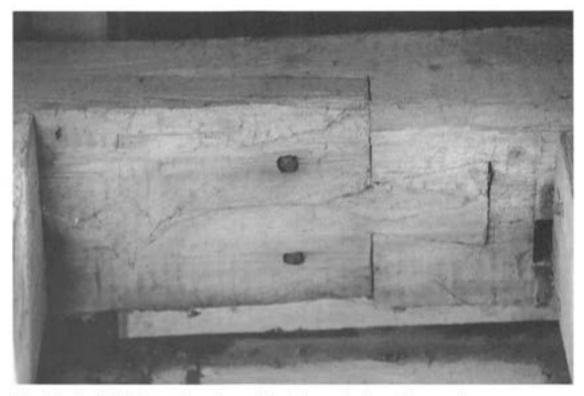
Marden Ash, Newhouse Farm, the scarf joint in the arcade plate of the western barn.
